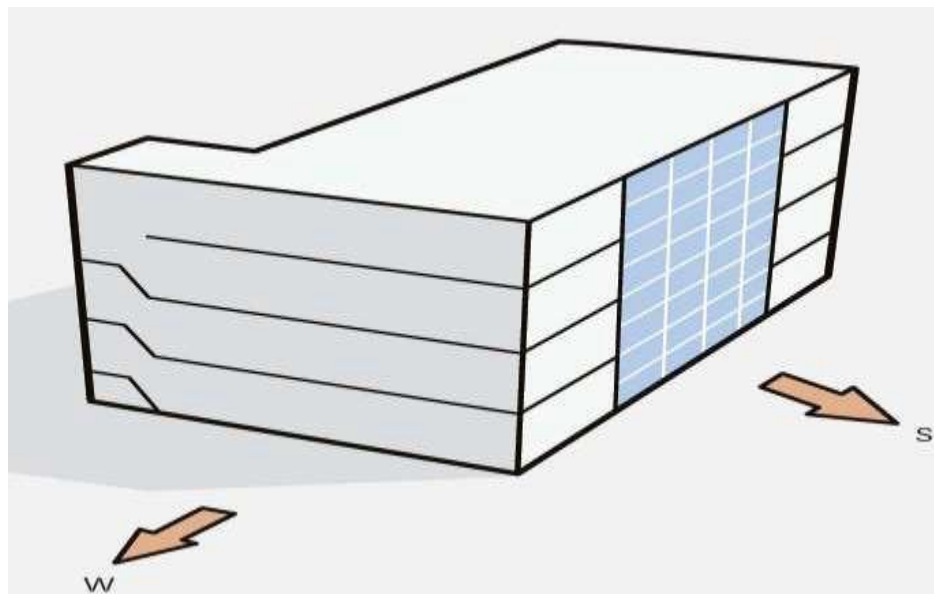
An example of facade, balcony and stair application (Güneş, 2019)
